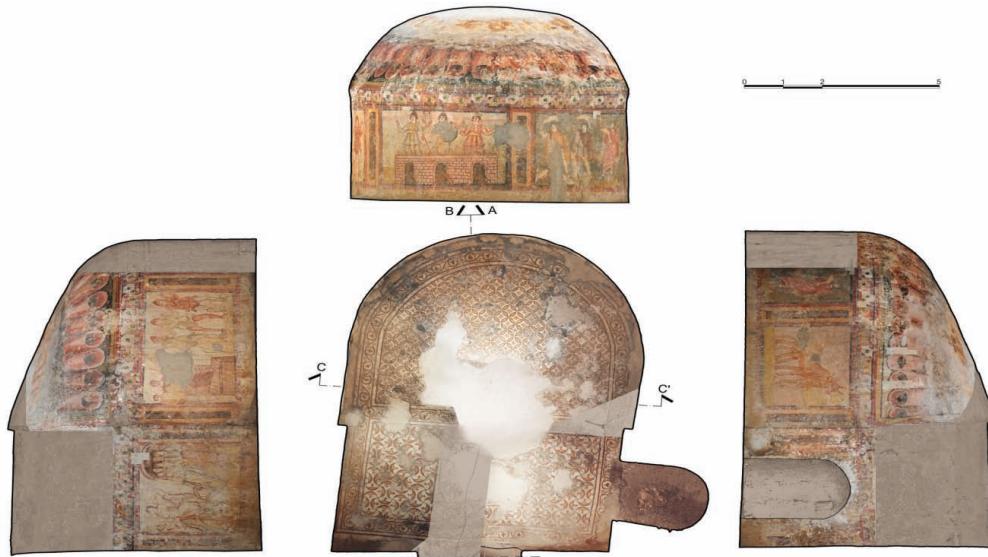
Plan view and elevations rendered with floor's photoplans and wall's orthophoto.
